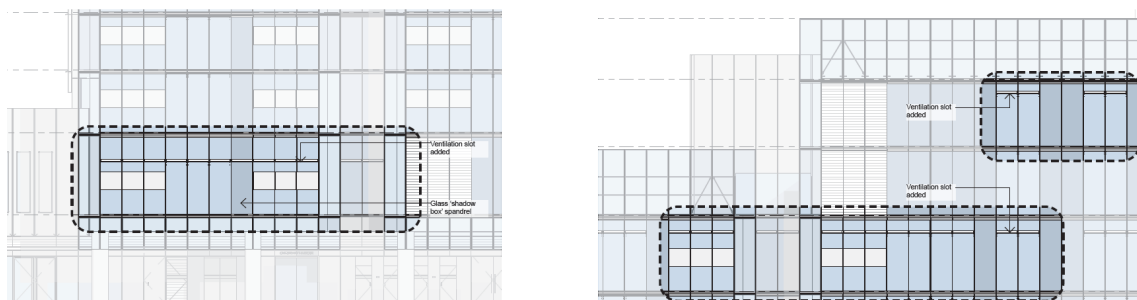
Proposed east elevation identifying ventilation slots – Level 1
